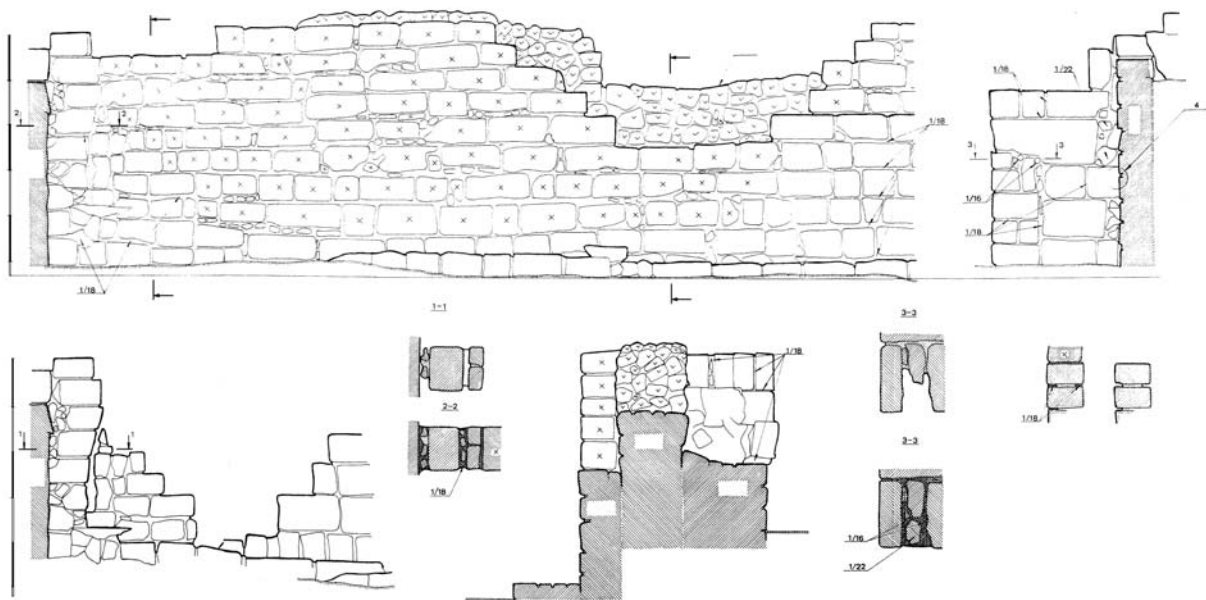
Stone Replacement, Vault 1. North Wall - West. Facing North. (Eng. Lilya Suchanov, IAA)
